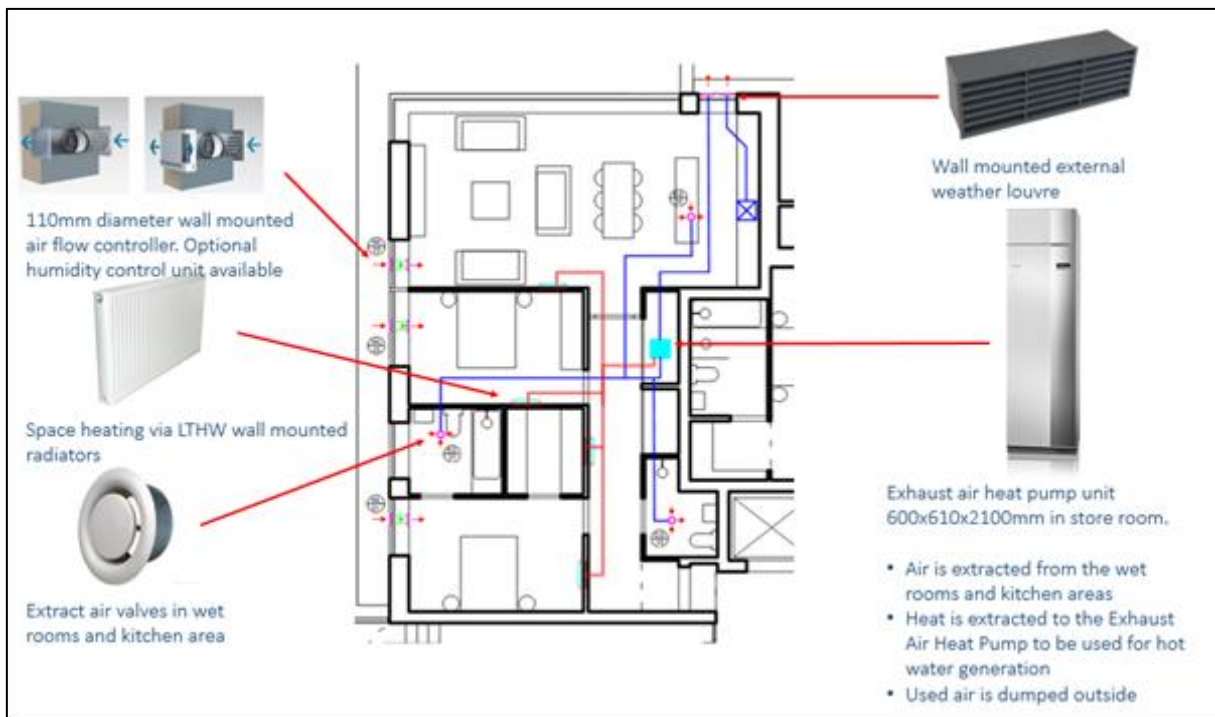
Example Diagram of Typical Exhaust Air Heat Pump Layout (Example)
